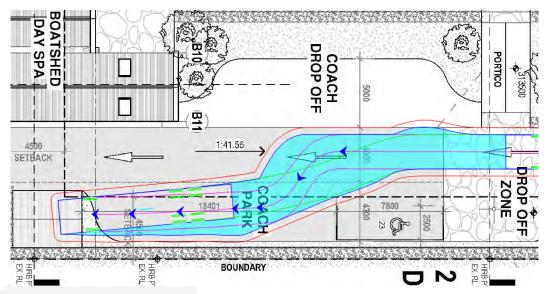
Coach Entering Parking Area Avoiding Mobility Parking Space
